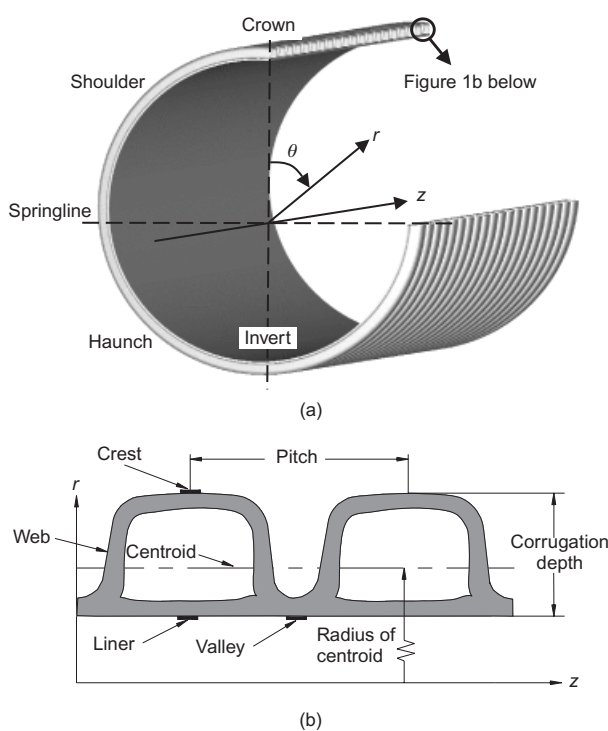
(a) Section through lined-corrugated pipe; (b) cross-section of pipe wall showing location of strain gauges at crest, valley and liner of the profile
